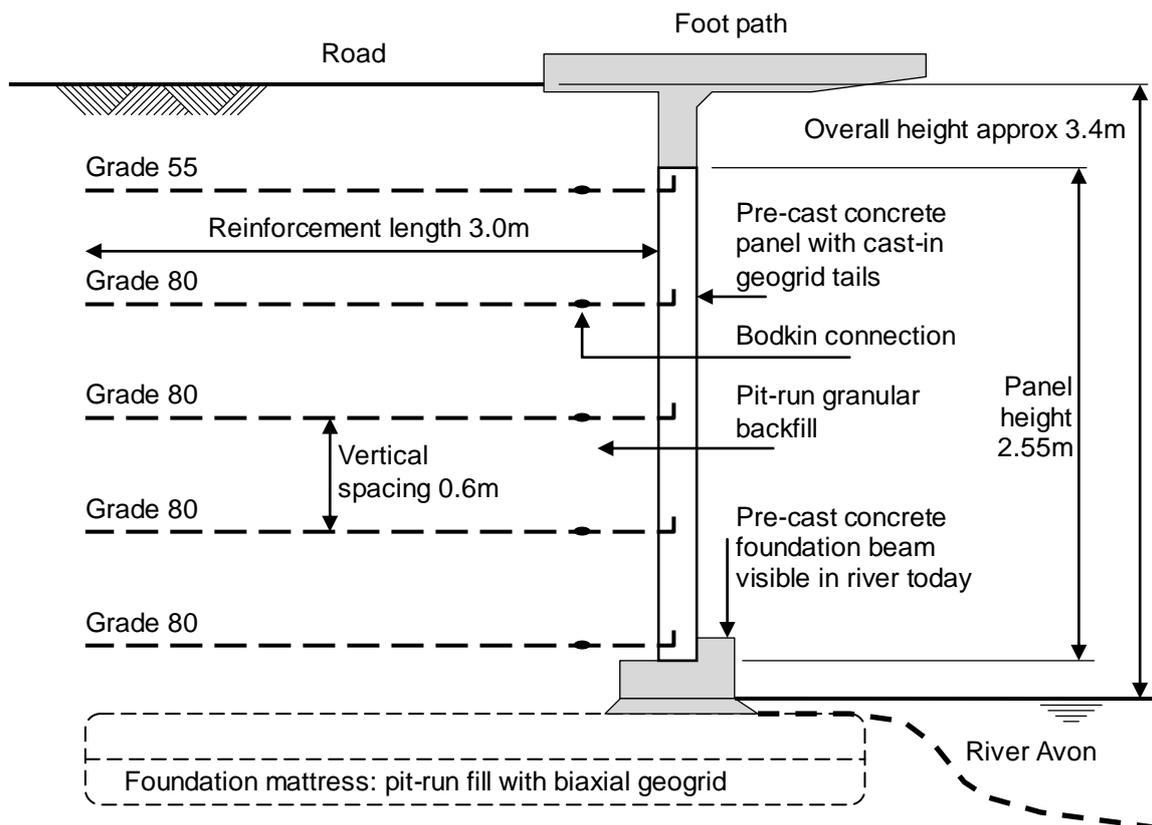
Section through the reinforced soil retaining wall at Carlton Mill Road
